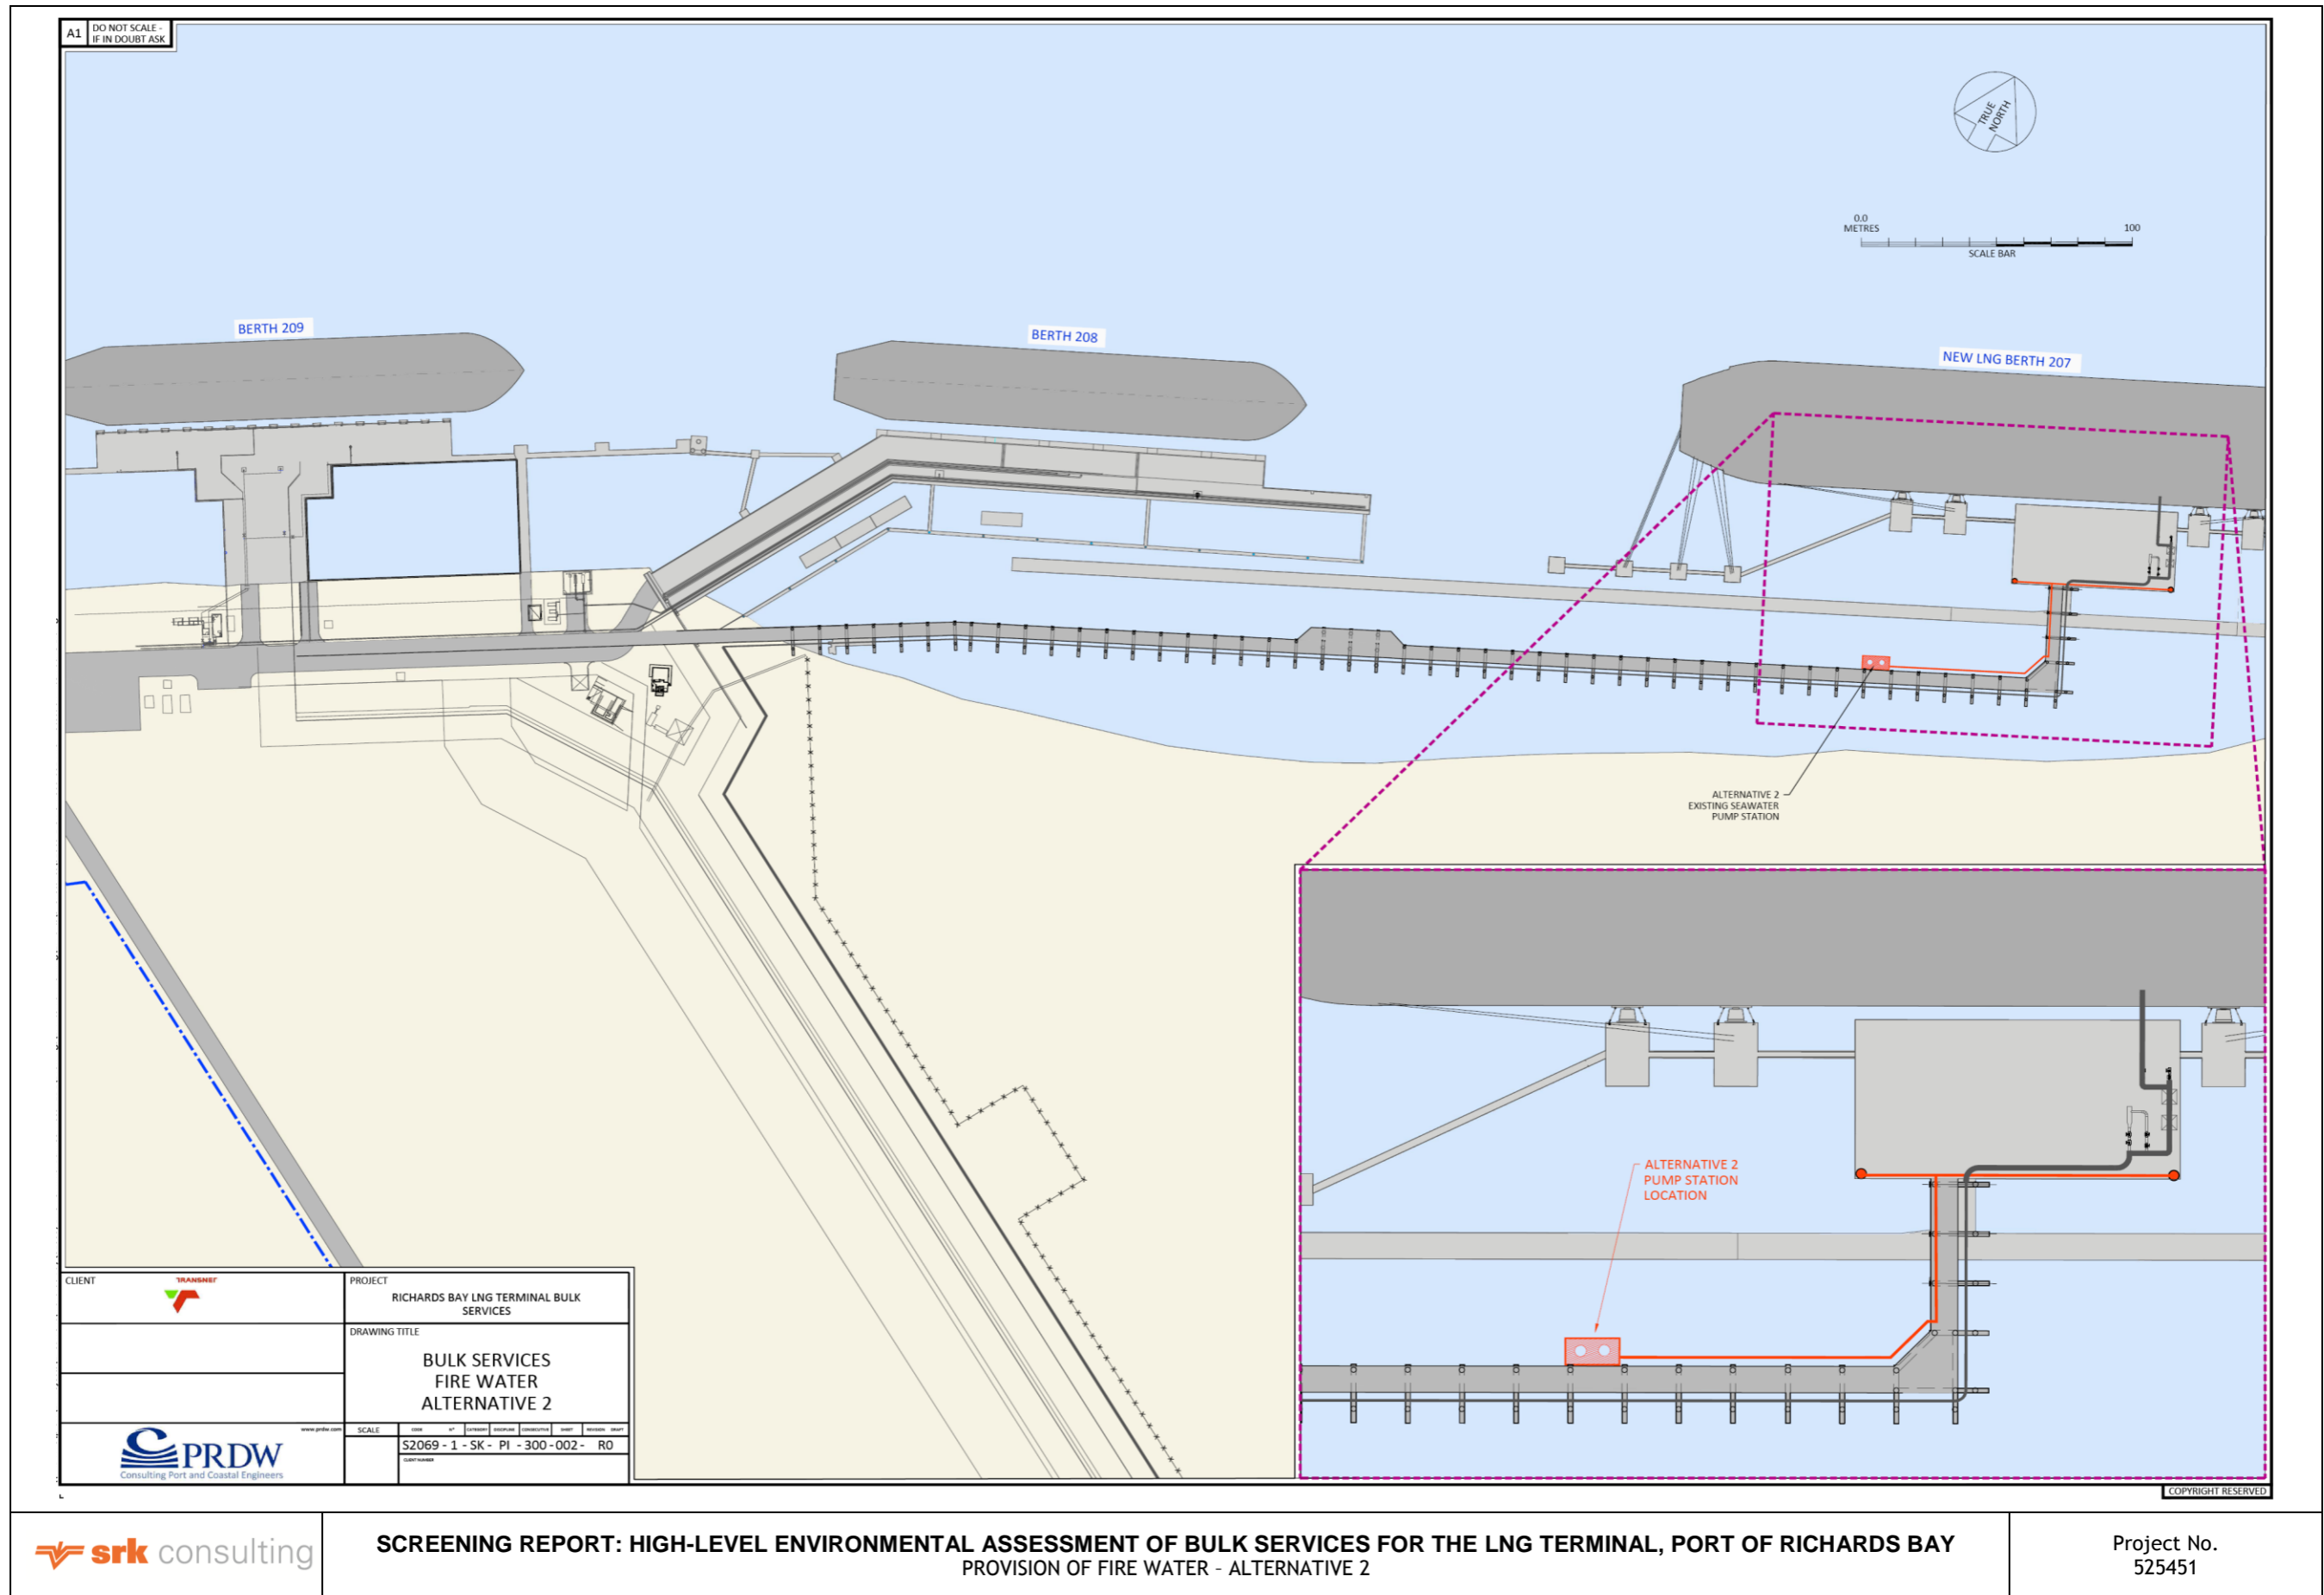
Provision of fire water – Alternative 2 (Note: the red indicates the proposed new infrastructure)
